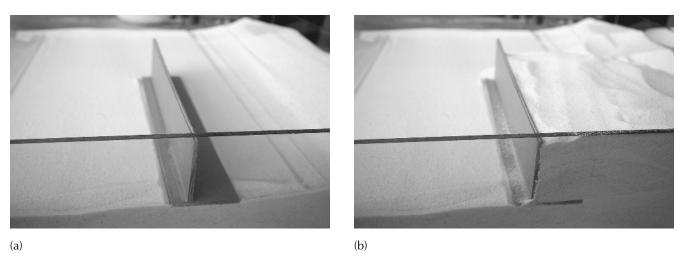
Cantilevered retaining wall (a) before and (b) after loading.
